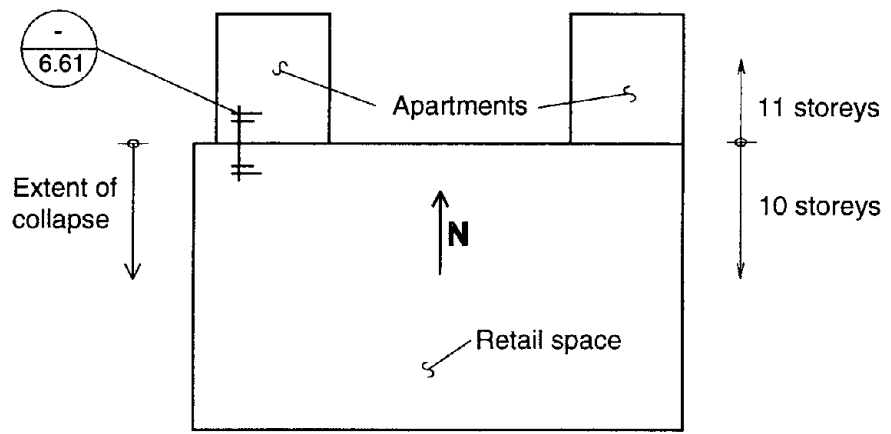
South elevation of an irregular, U-shaped, reinforced concrete building
